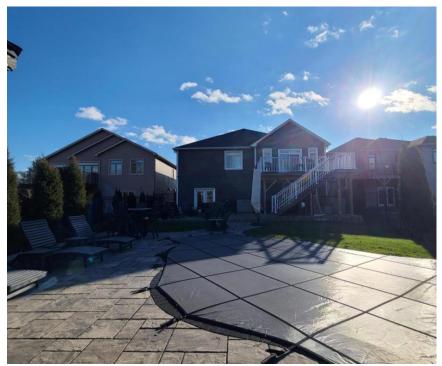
View of home from rear yard of subject property, showing existing deck and area where deck extension is proposed.
